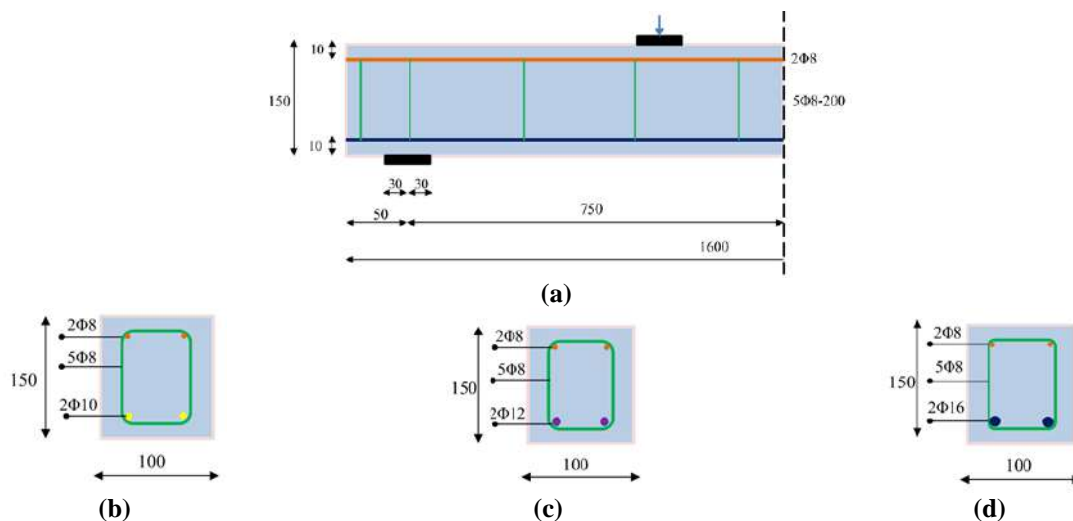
Dimensions and reinforcement information of FLC beams (units: mm): a) Half elevation of the test beam; b) Cross-section of low-reinforcement-ratio beams; c) Cross-section of medium-reinforcement-ratio beams; and d) Cross-section of high reinforcement ratio beams
